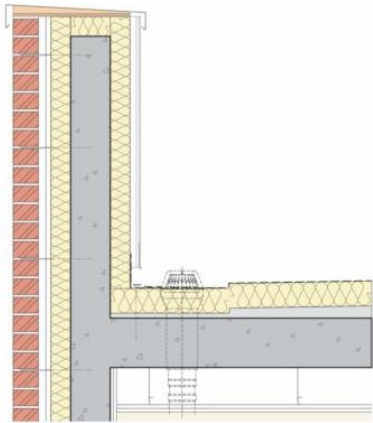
B: Parapet with Schöck Isokorb type AXT structural thermal break. Image: Schöck Ltd.
